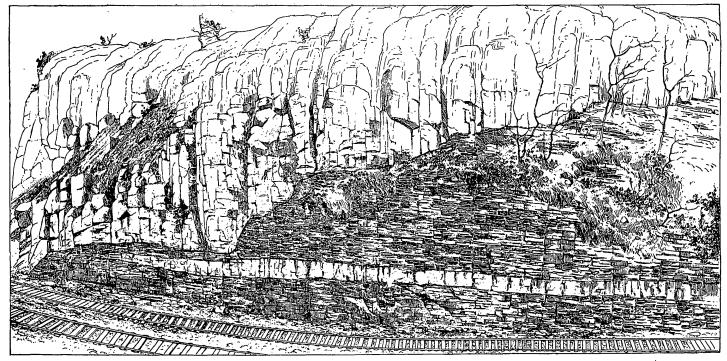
Contact of trap and inducated shales in entrance to West Shore Railroad tunnel, Wehawken, New Jersey. Looking south. From a photograph.
